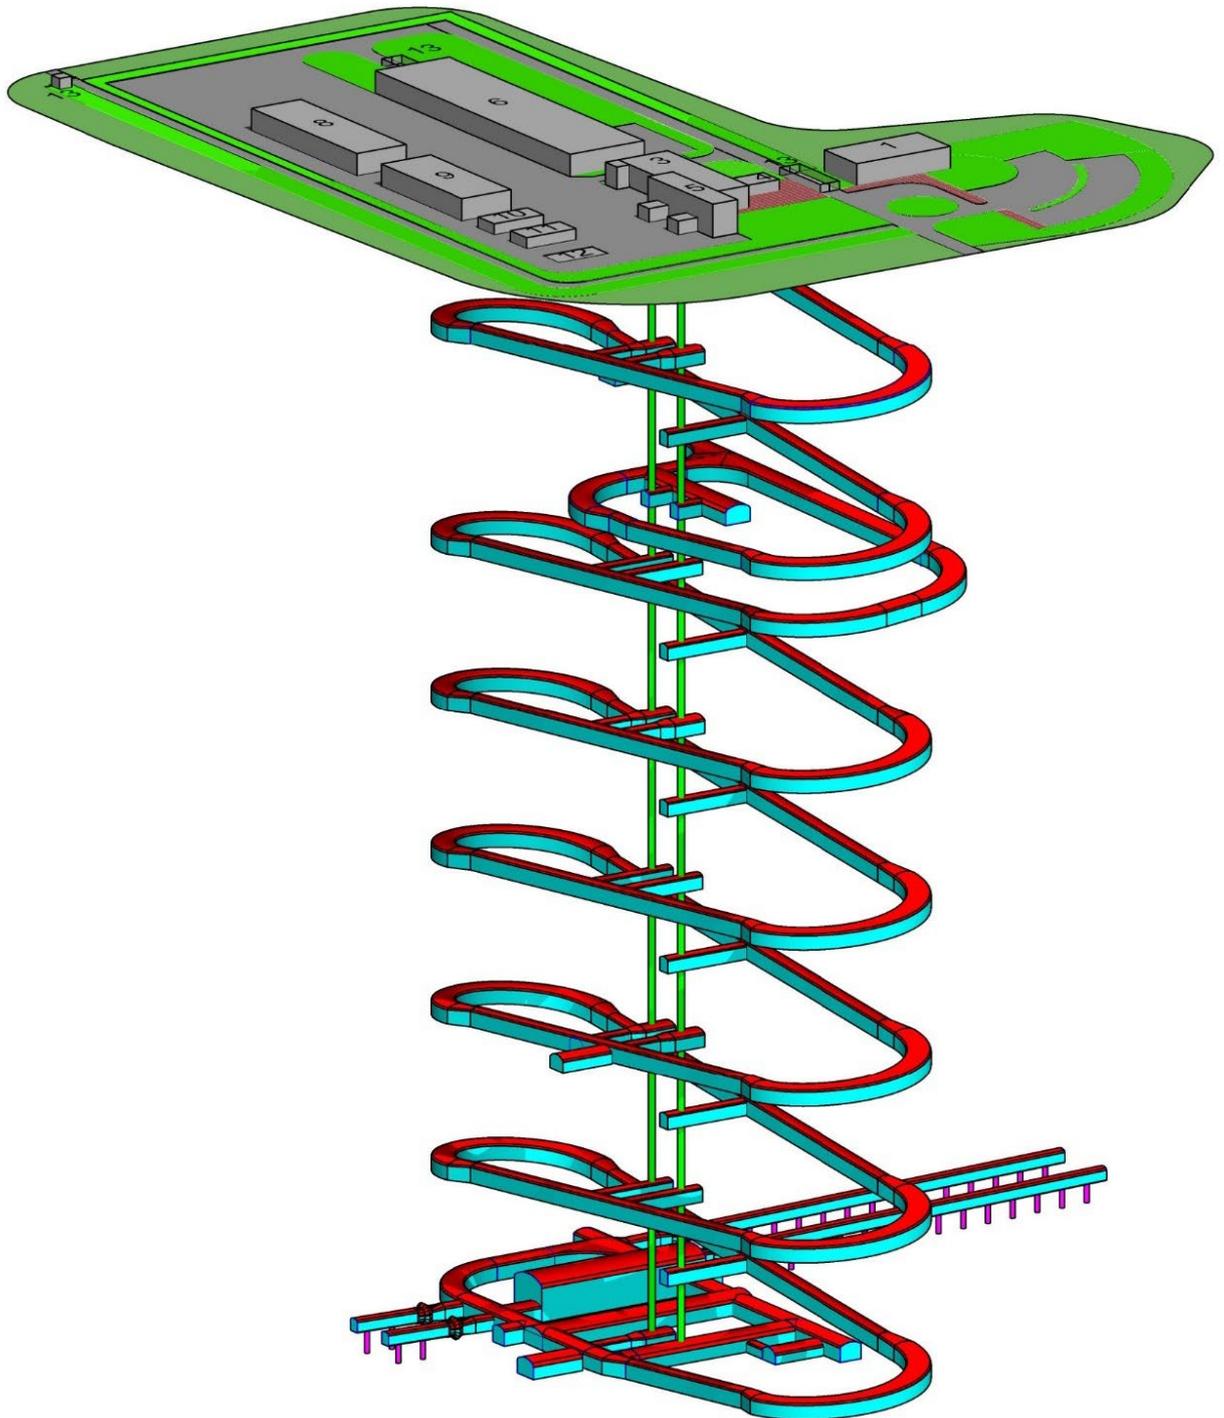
Illustration of the stand-alone Deep geological repository alternative. Above ground buildings: 1) Office building, 3) Operation building, 4) Guard, 5) Ventilation building, 6) Tunnel portal building, 8) Waste reception building, 9) Maintenance and storage hall, 10) Research building, 11) Backup power supply, 12) Refuelling station and 13) Control.
